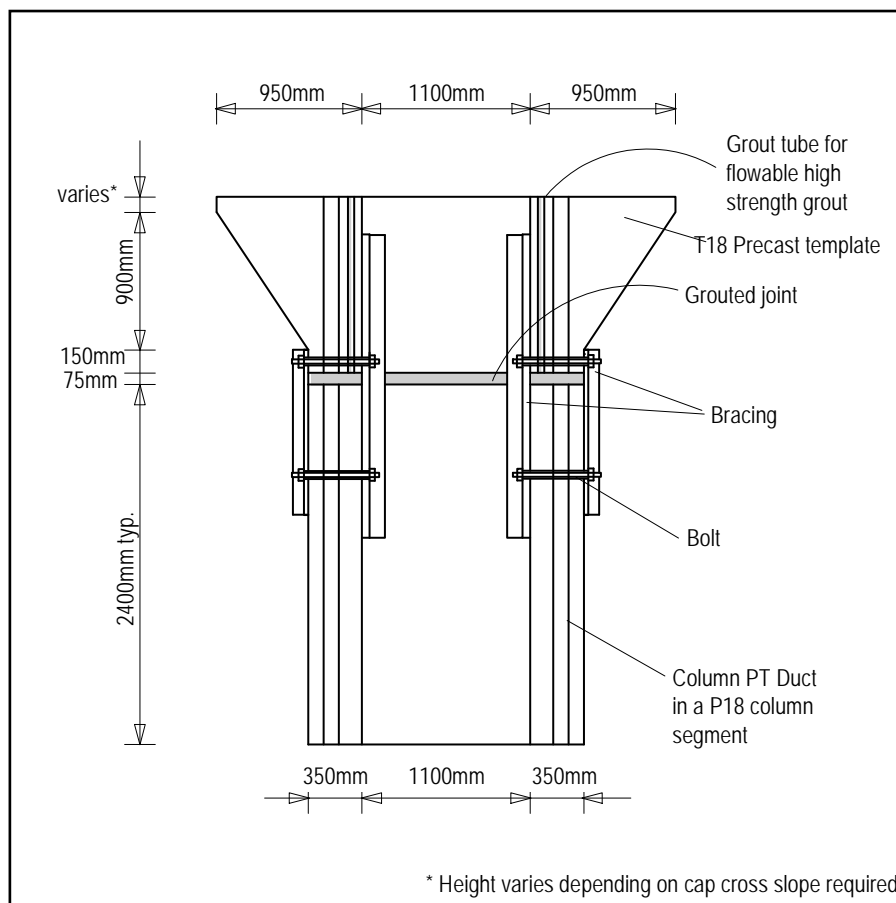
Cross section through a P18 pier showing grouting of the template to the top column segment
